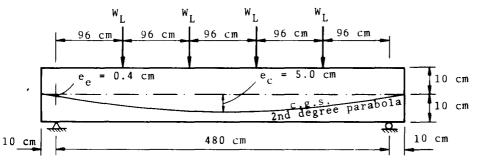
Beam 4 [unbonded prestressed one-way slab-type member (parabolically draped tendons)]
